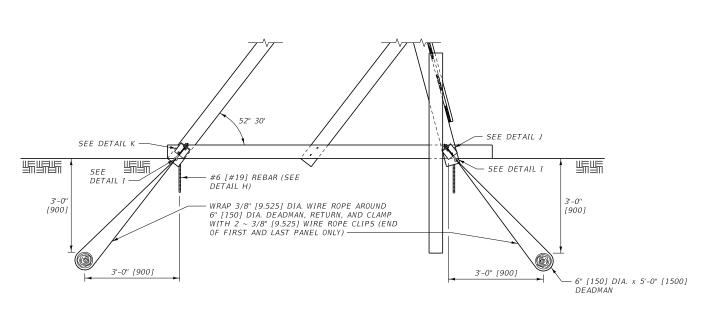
DETAILED DRAWING REFERENCE DWG. NO. STANDARD SPEC SECTION 607 607-40
